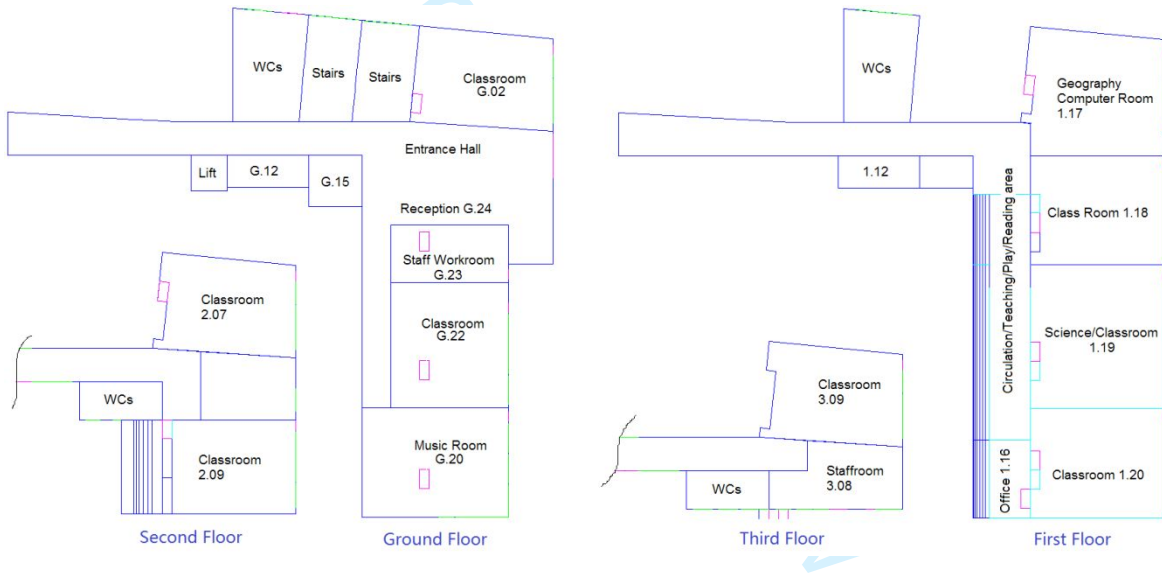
Floor plan views (second and third floors, the narrow extruded parts were cut off)
